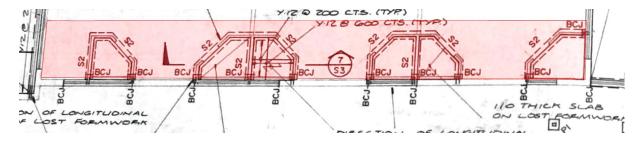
Suspended Ensuites - Showing Possible Extent of New Timber Floor Framing
